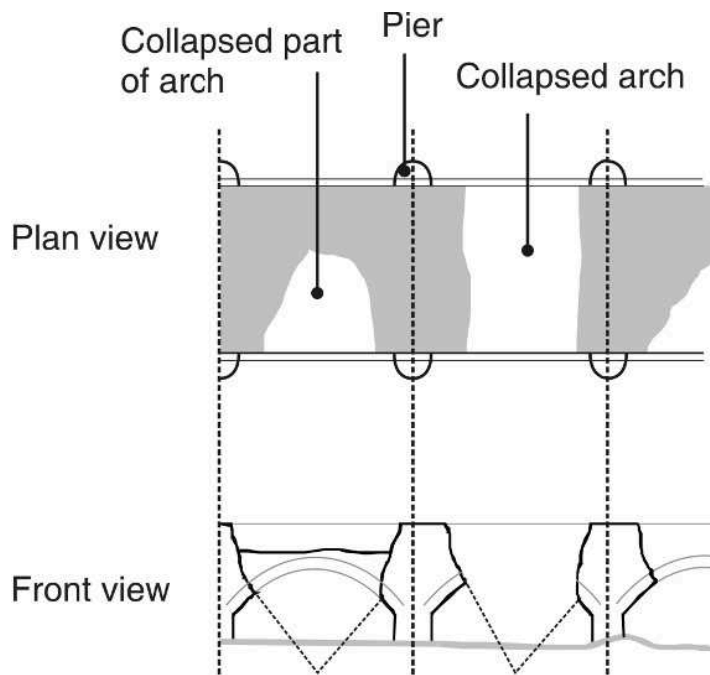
Partial collapse of Traversa Bridge, taken from [Brencich and Colla, 2002]
